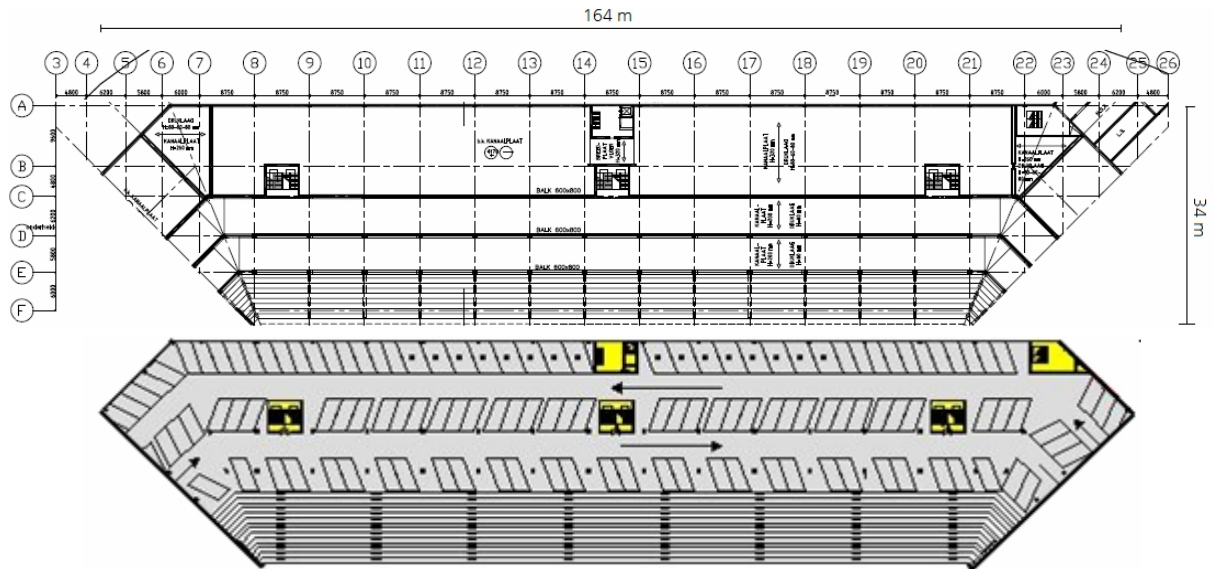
Structural and functional plan for the -1<sup>st</sup> floor
